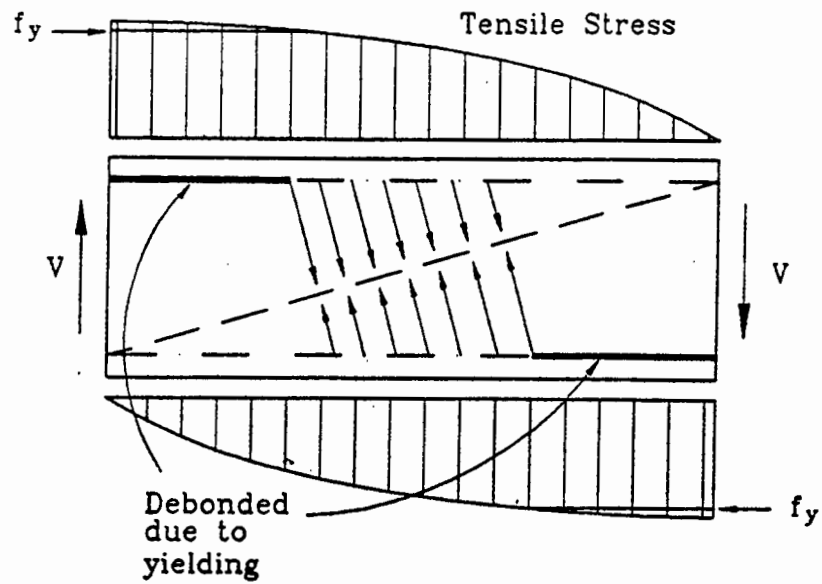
Decay in the Concrete Shear Resistance due to Longitudinal Rebar Yielding.
